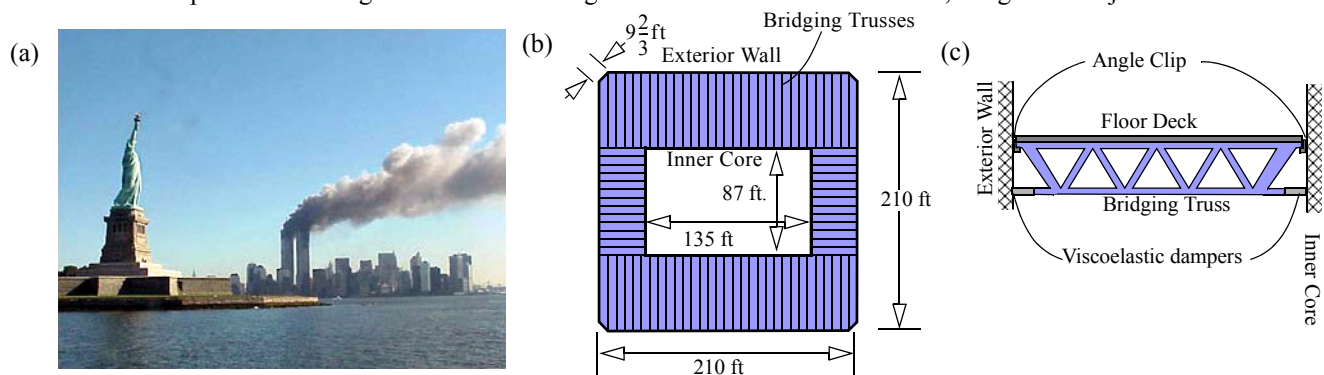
(a) World Trade Center Towers; (b) Plan form; (c) Floor.
